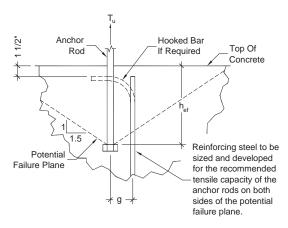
The Use of Steel Reinforcement for Developing Anchor Rods
